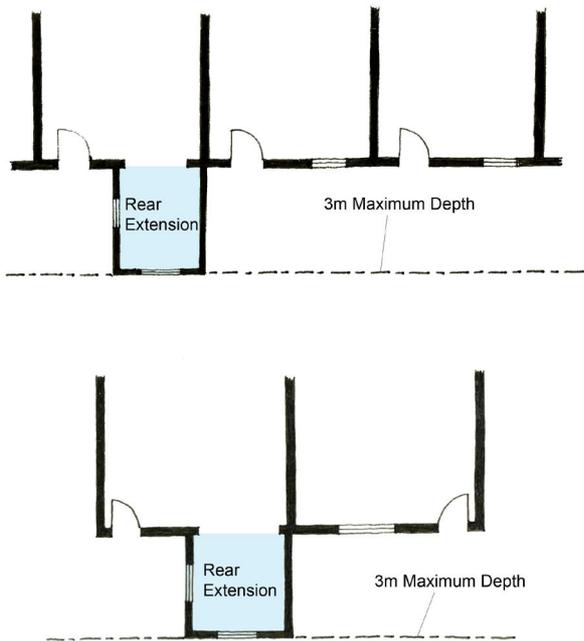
Single-storey rear extensions to terraced and semi-detached houses should not exceed 3m in depth.
